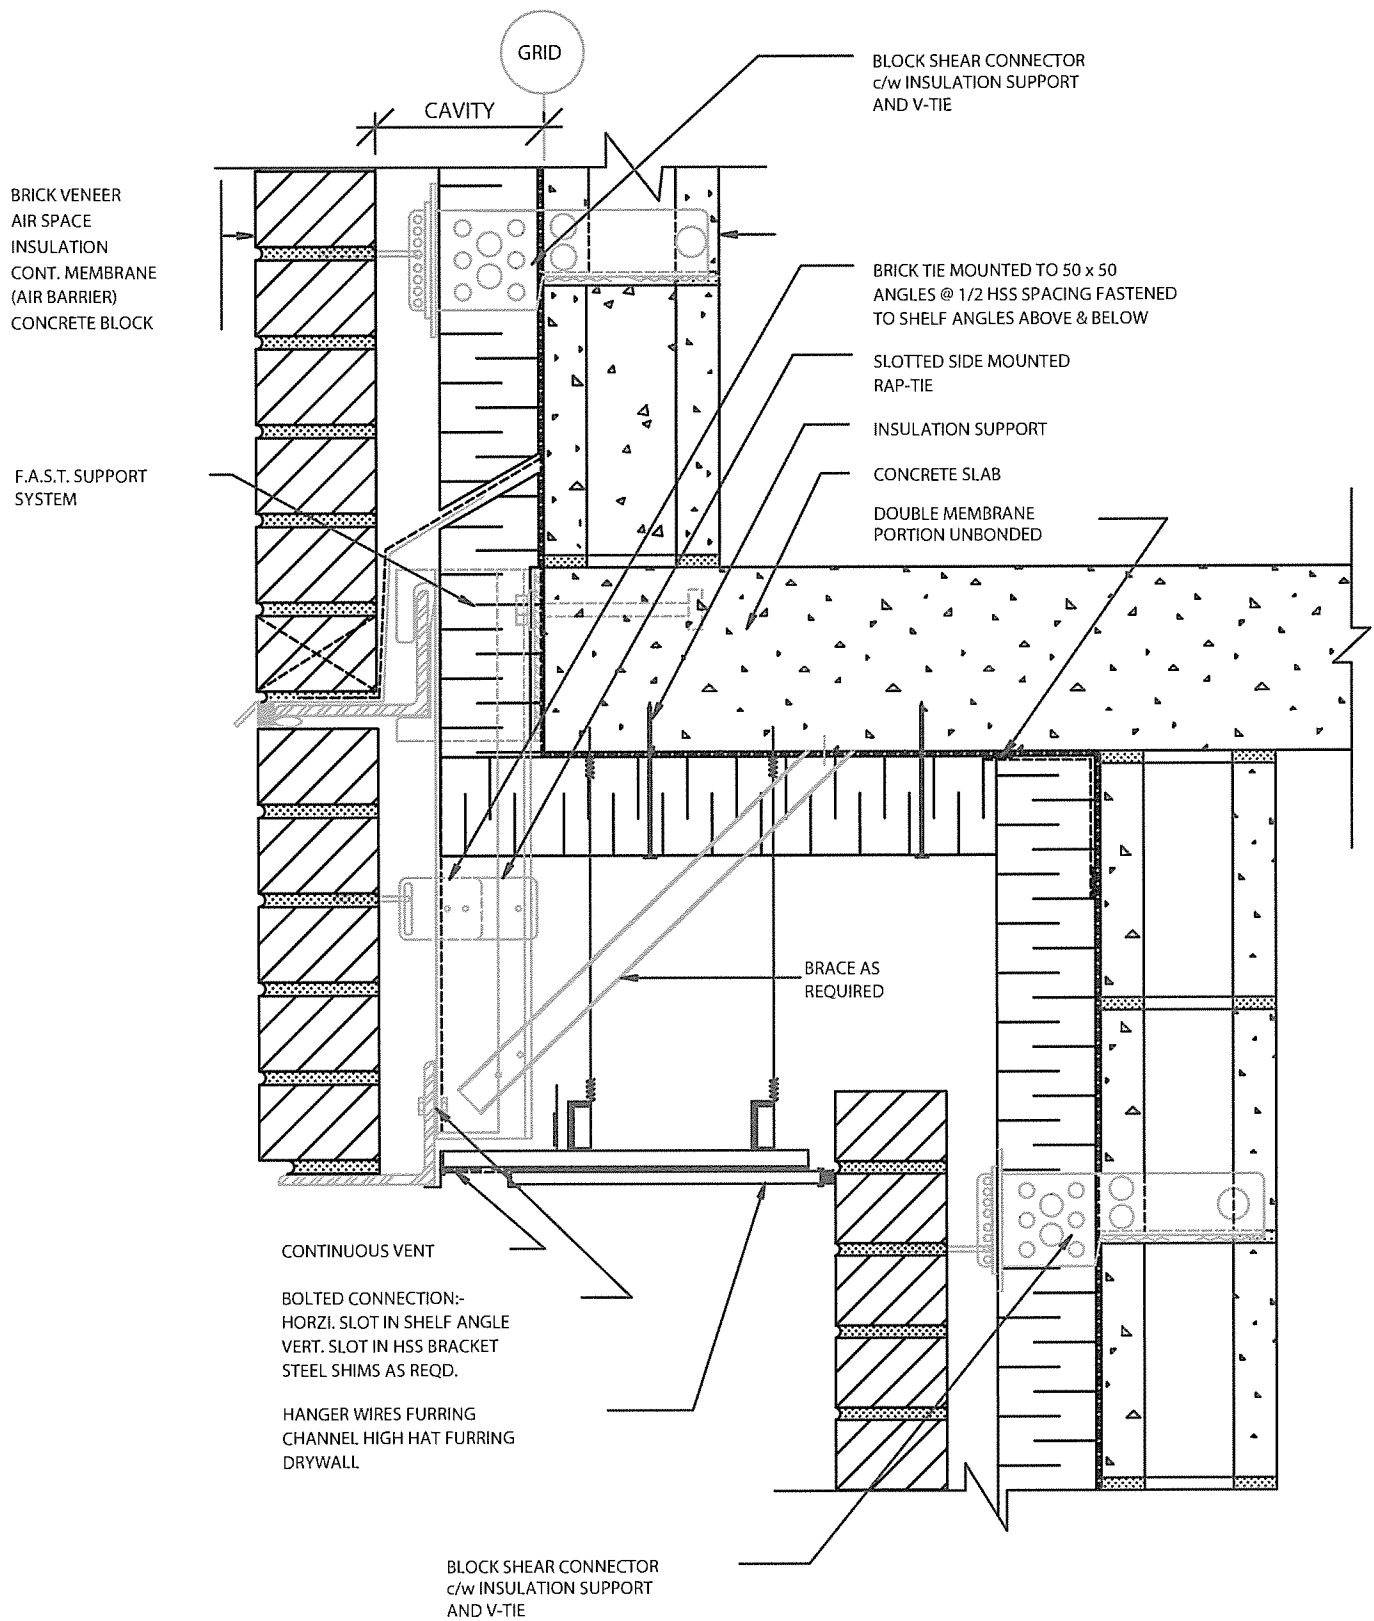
BRICK VENEER/CONCRETE BLOCK-COLD SOFFIT DETAIL
